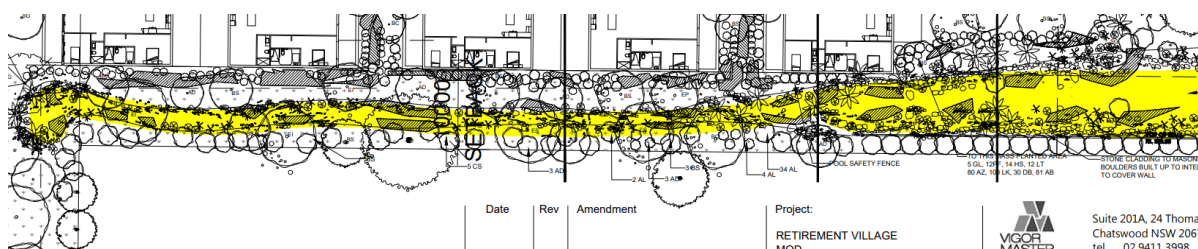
Proposed Landscape plan. Drainage swale highlighted in yellow for clarity
